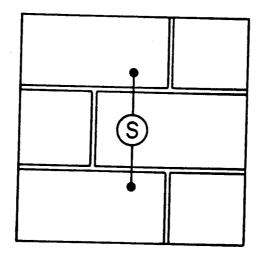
Elevation View of Loading Arrangement for Type II Specimens
